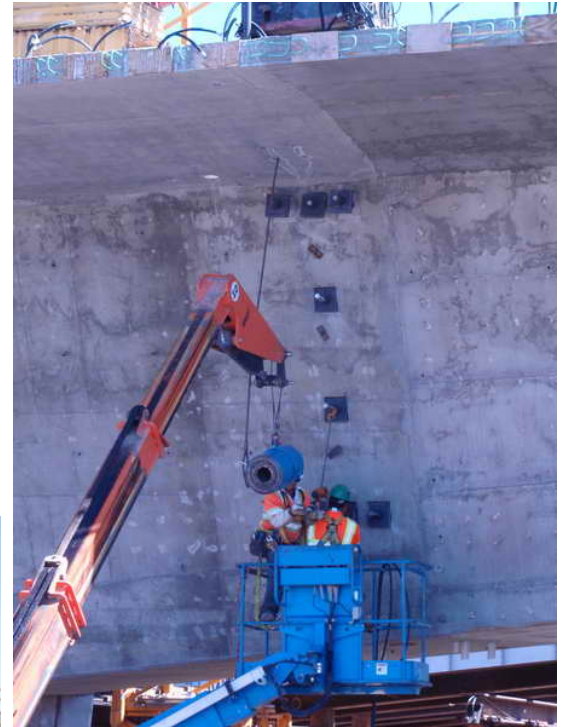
Cantilever 3 WB Segmental Construction– April 9, 2009:
